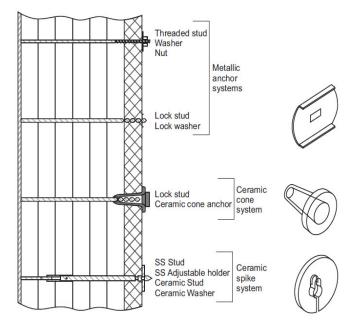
Typical Layered Fiber Lining Anchoring Systems
